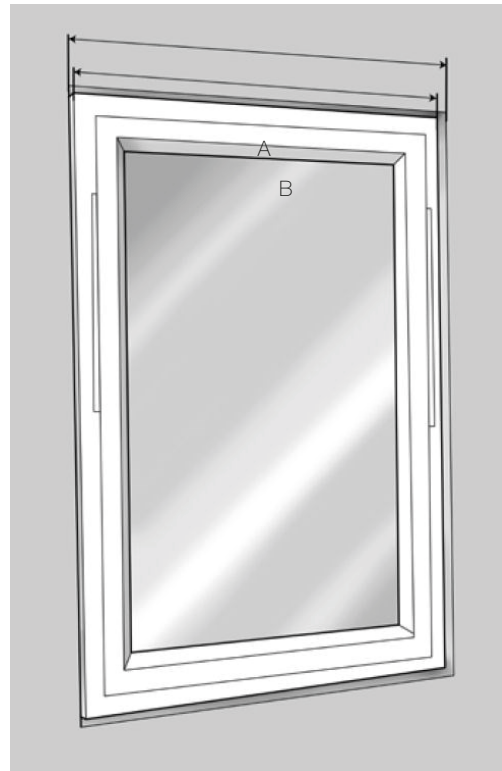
A gives the window opening dimensions B gives the frame's outer dimensions (A-20 mm)
